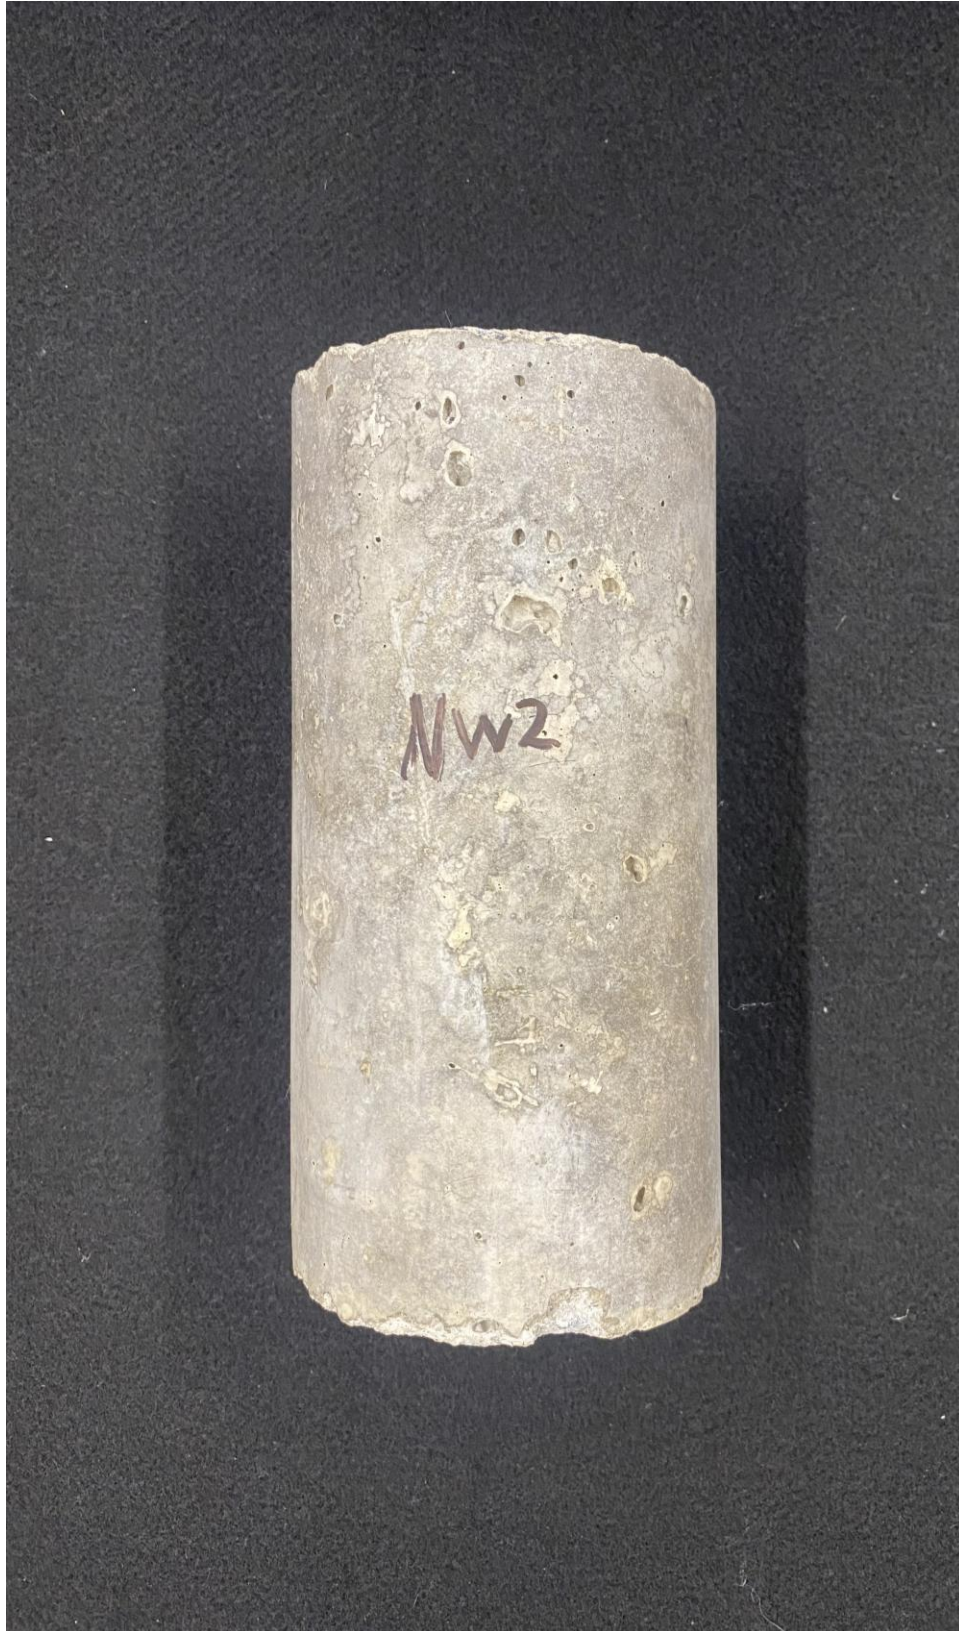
Cylinder 2 of normal-weight concrete deck at bridge F-818 (after testing).
